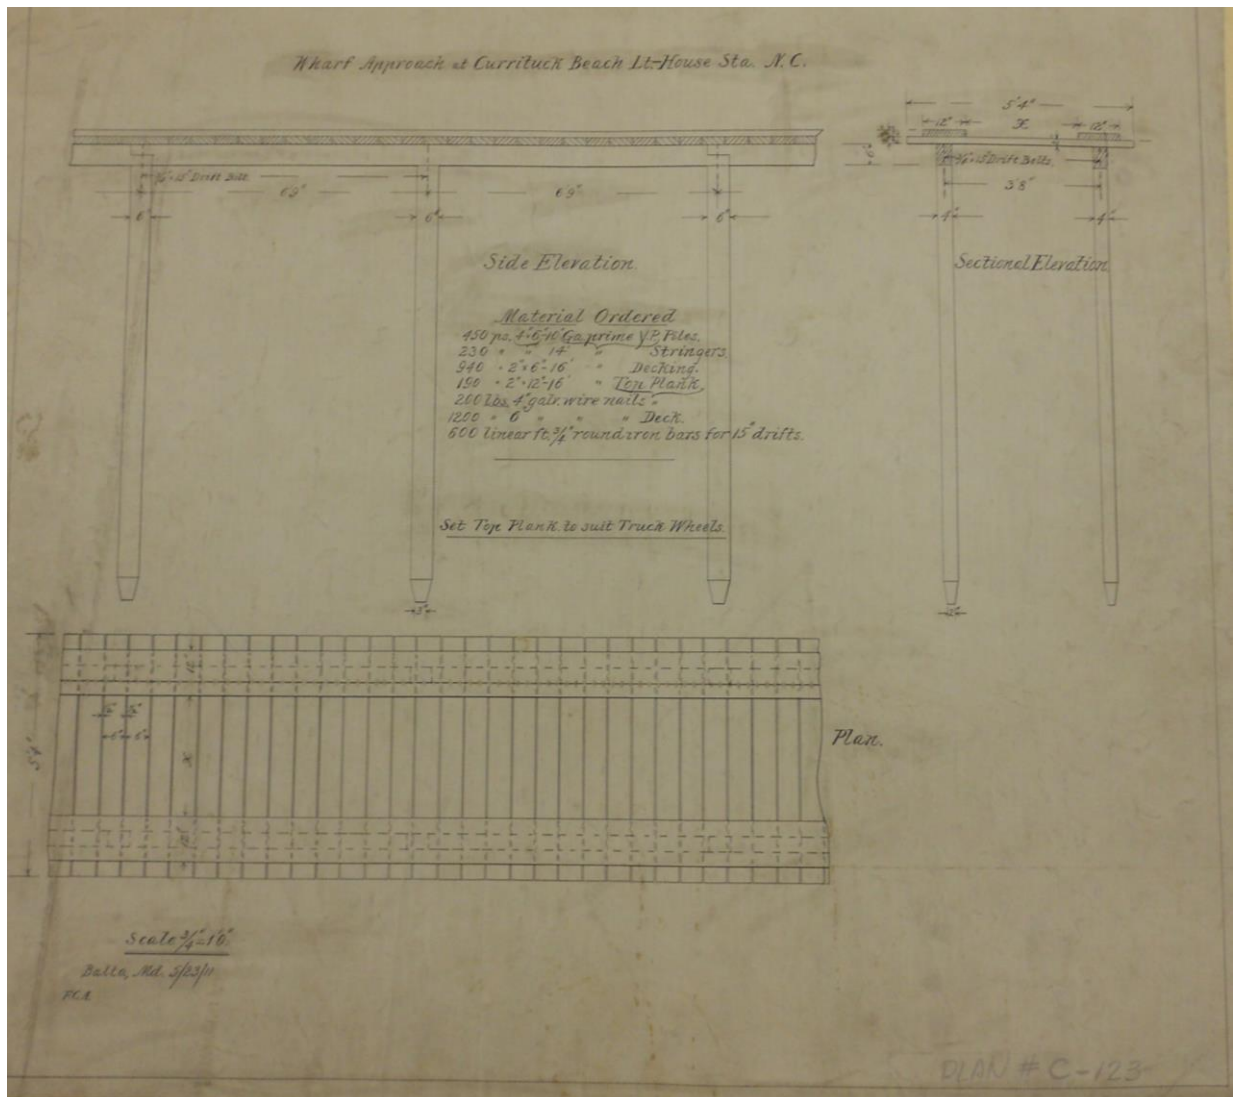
Original construction drawing of the CBLs wharf (Stetson 1877).
